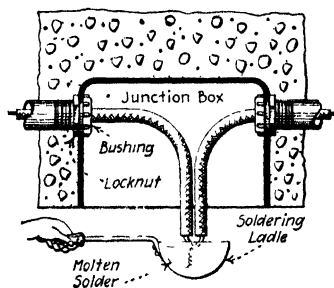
Soldering with ladle. To solder the splice, the ladle is raised up so that the joint will dip in the solder. At first, a thick coat of solder will stick to the wire. This indicates that the joint is not sufficiently hot. Continue raising and lowering the ladle until the solder runs freely from the joint, leaving a thin coat on the wire without lumps or drops
